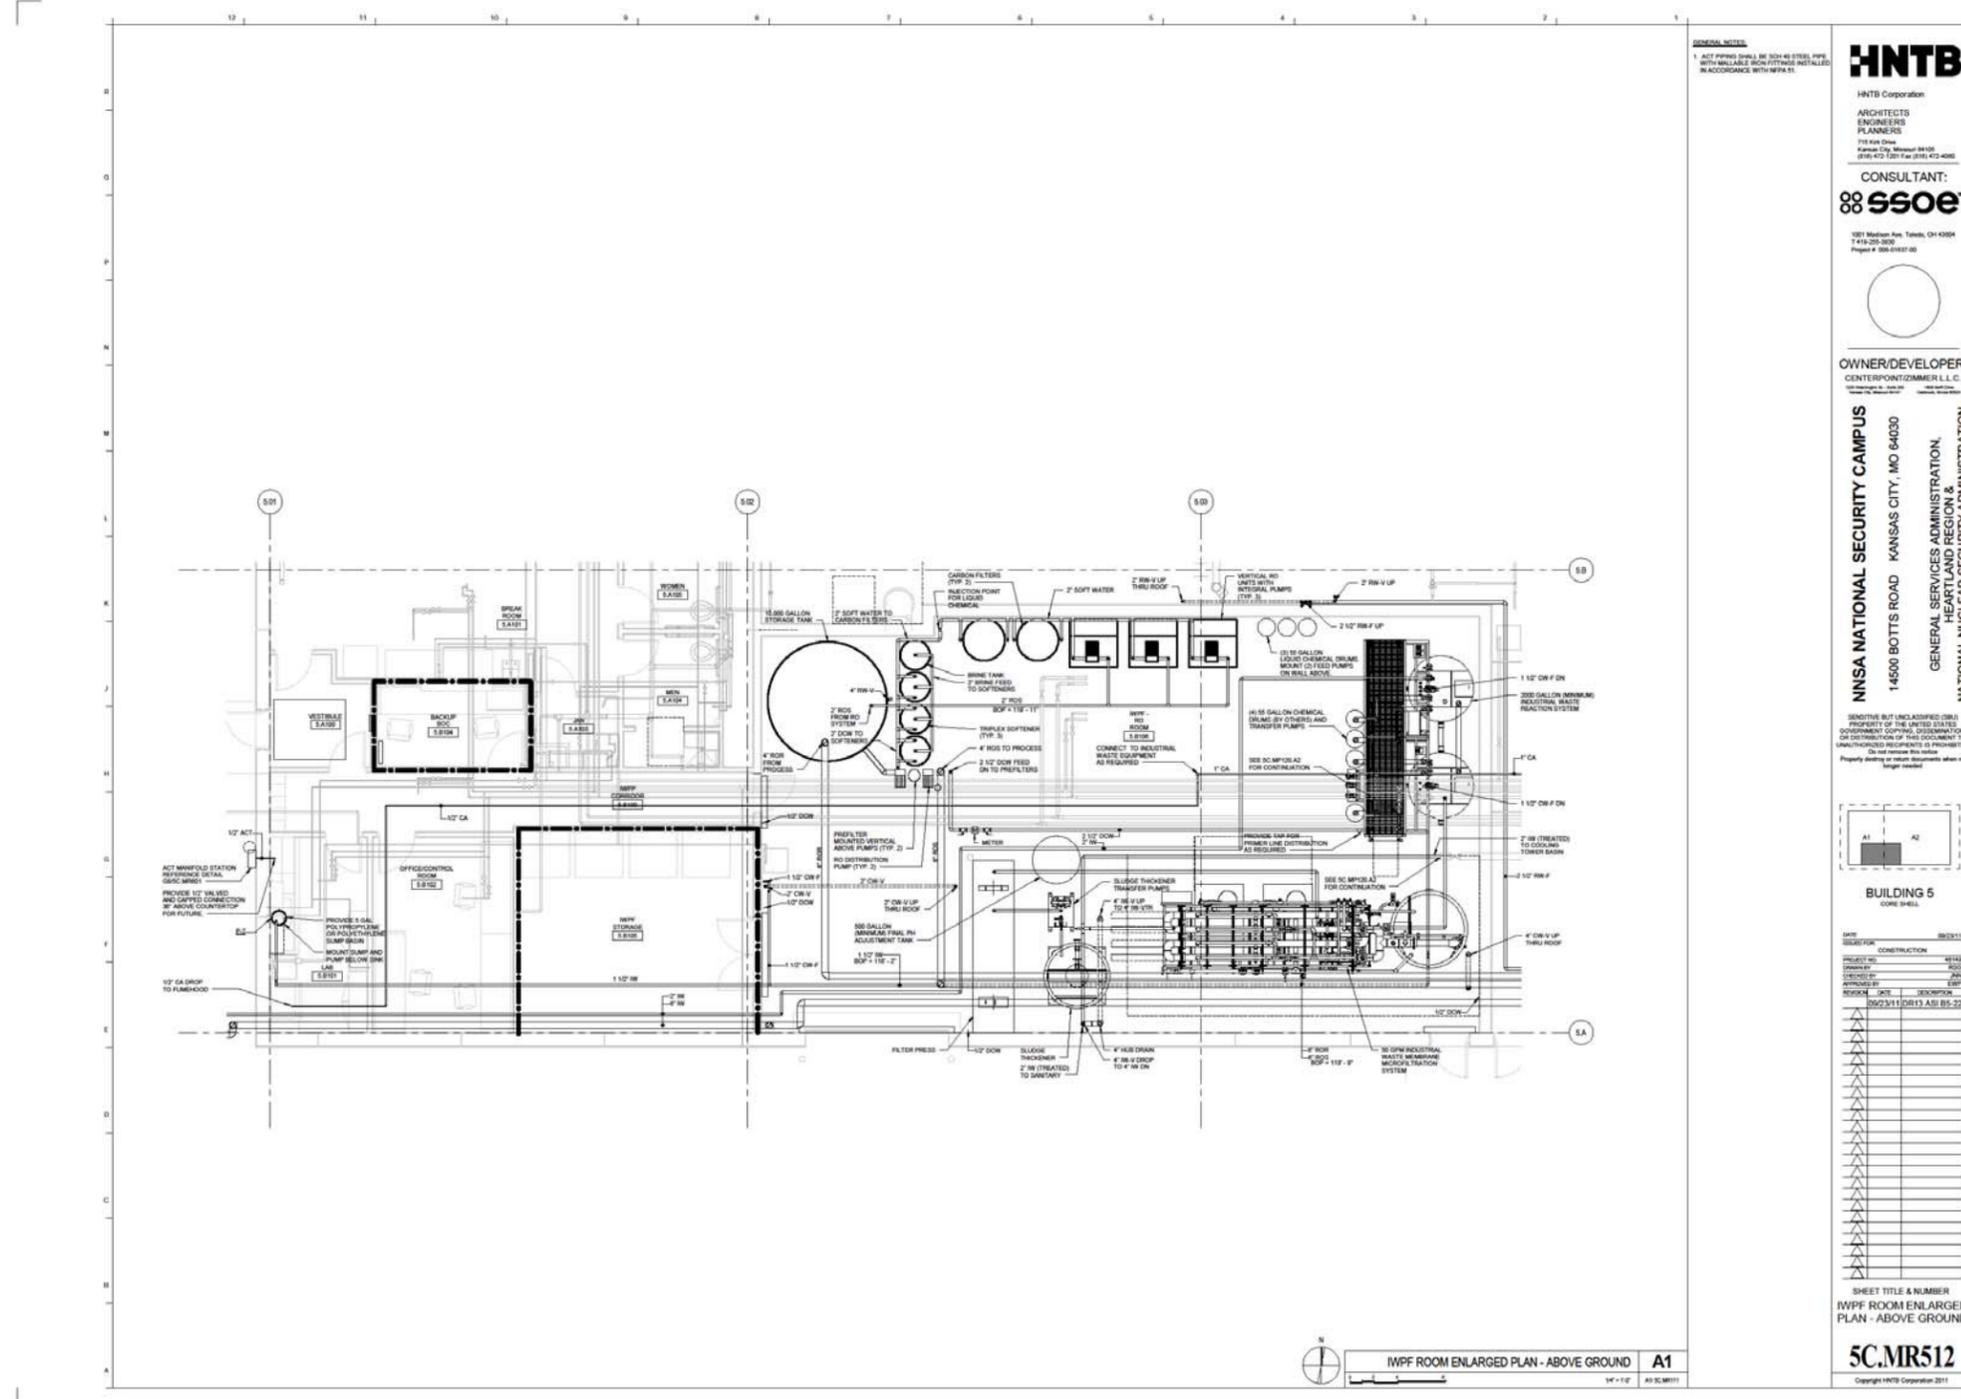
INDUSTRIAL WASTEWATER PRETREATMENT FACILITY LAYOUT
